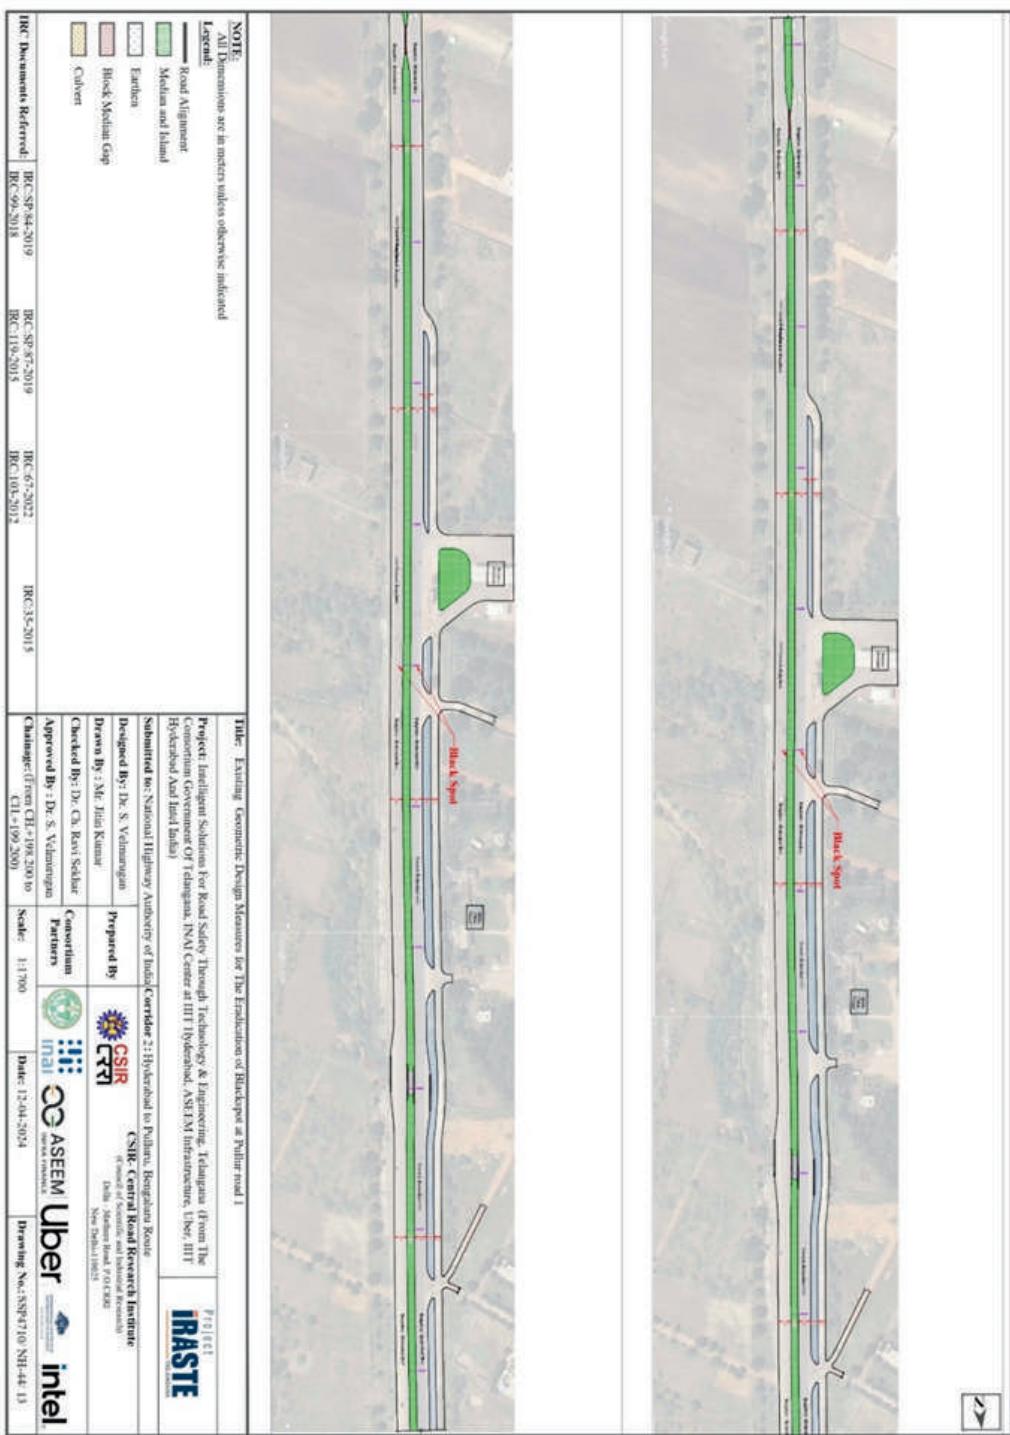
Detailed GDP of Pullur Road 1 Area on NH-44
